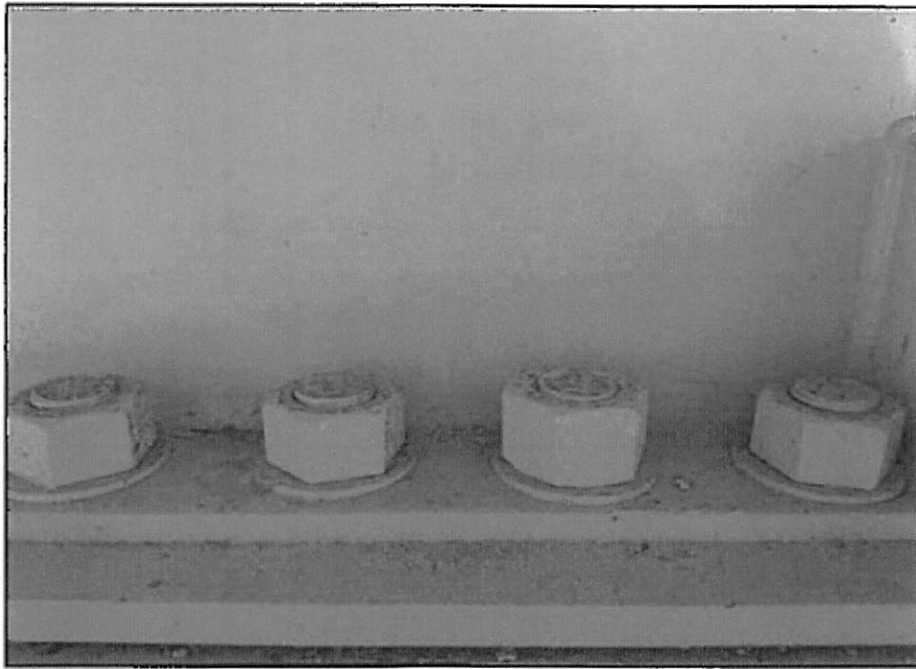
Typical view of the anchor bolt nuts engagement at west face of the slide bearing.
